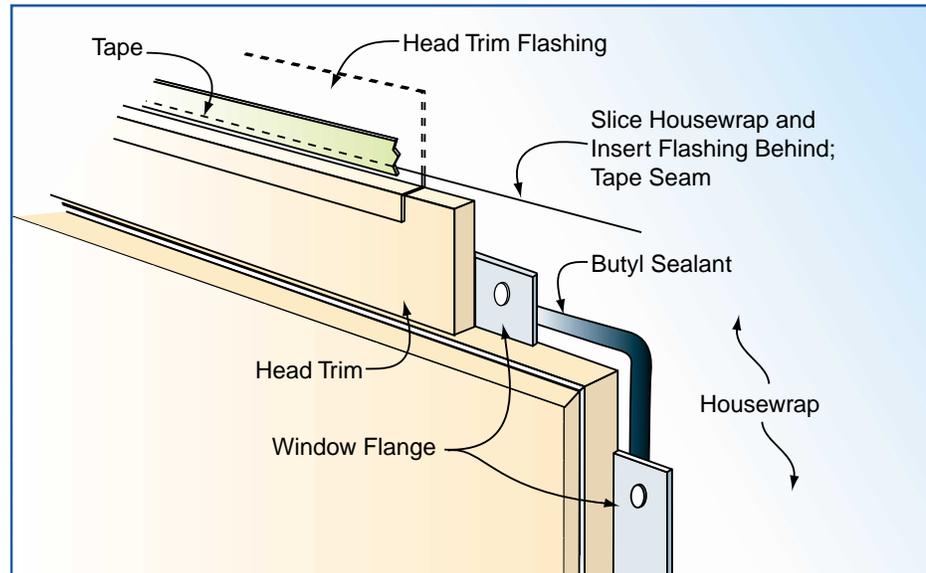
Window flashing detail. Courtesy of Journal of Light Construction.
